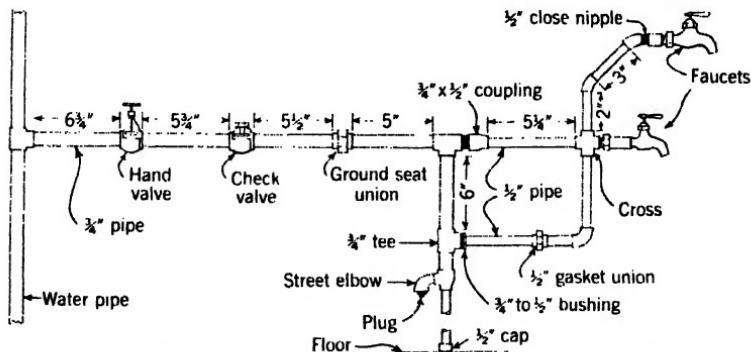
A piping assembly suitable for practice in cutting pipe and "making" joints. This assembly contains the most common pipe sizes and the most common valves and fittings used in farm plumbing. When the assembly is completed the water pressure can be turned on to test the joints, the valves, and the faucets. The faucets and valves may be used for practice in faucet and valve repair.
